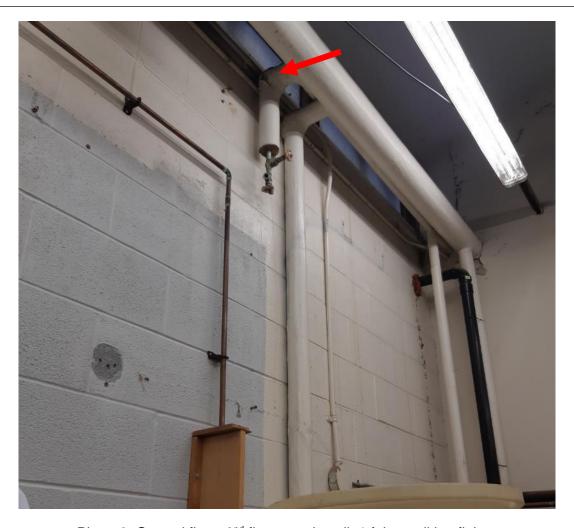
Ground floor, 2nd floor, south wall, 1 fair condition fitting.
